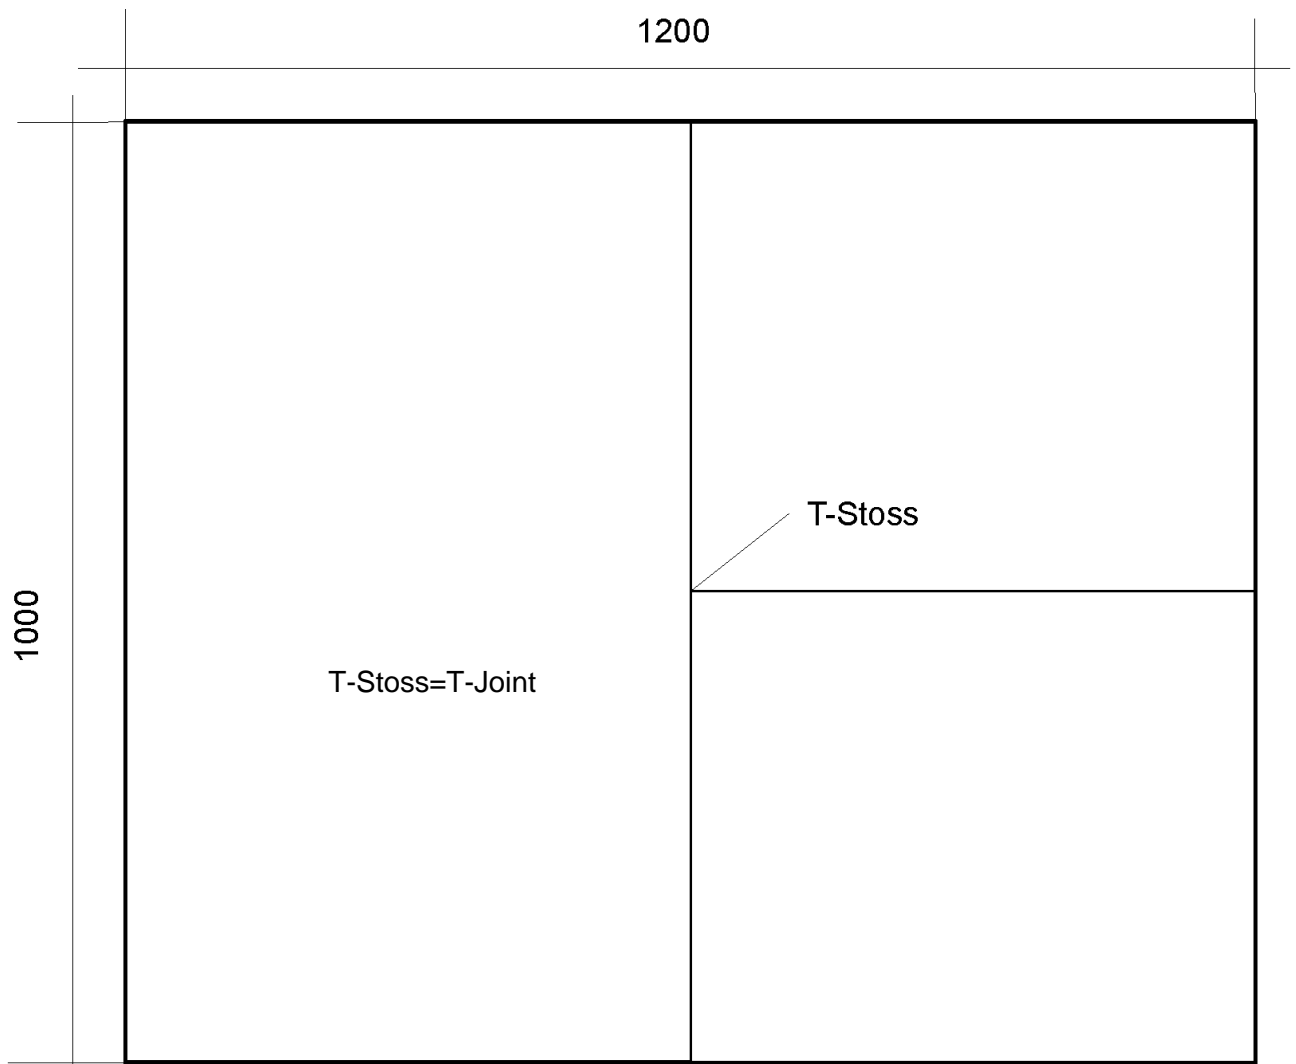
Lay-out of the test specimen (dimensions in millimetres)
